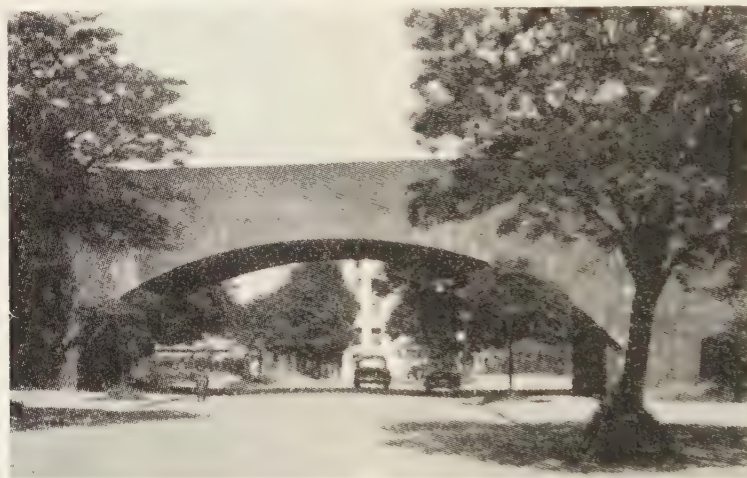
Bridge with brick masonry arch over the Alteburger Strasse at Cologne-Bayenthal, built in 1912-13.
